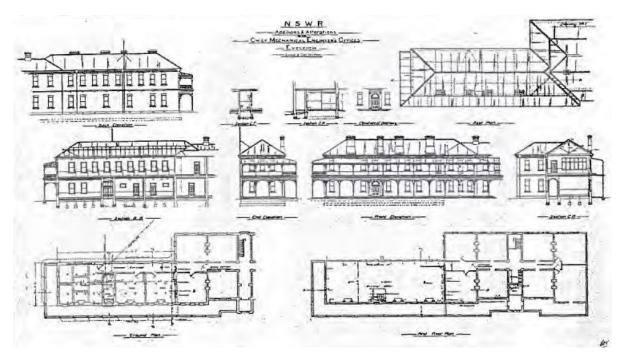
Plans, sections and elevations of the 1900 addition showing the sympathetic treatment of the extended façade to that of the original 1887 construction. Source: Rappaport & Caldis Cook Group, 1997.
